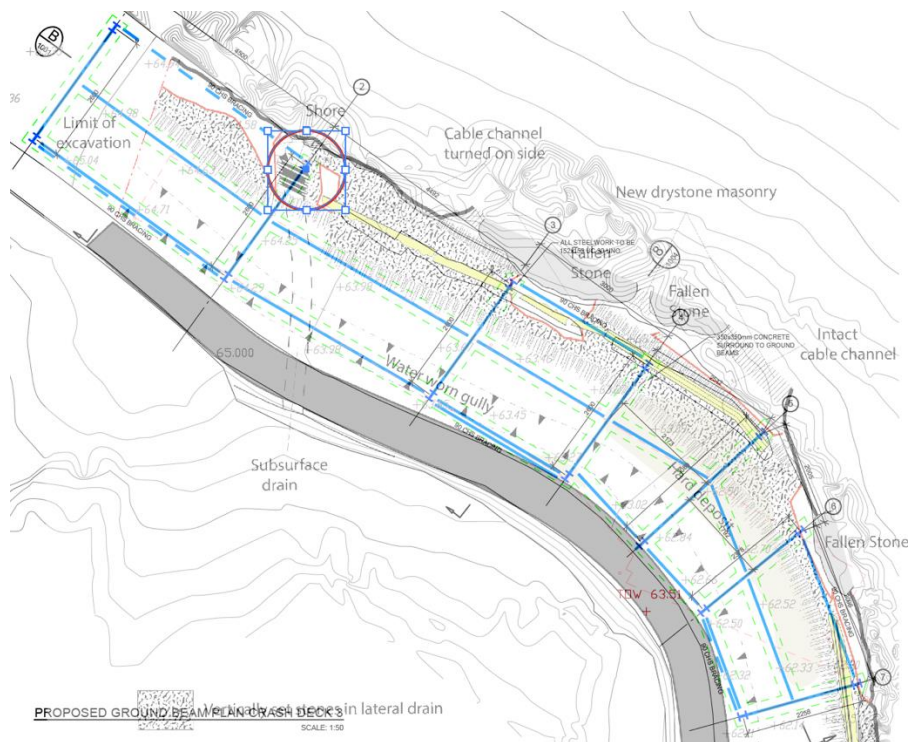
Plan of archaeological features in area of Crash Deck 3 overlain on plan of proposed Crash Deck 3k groundworks with location of shore and drain and beam to be relocated marked with red circle.
